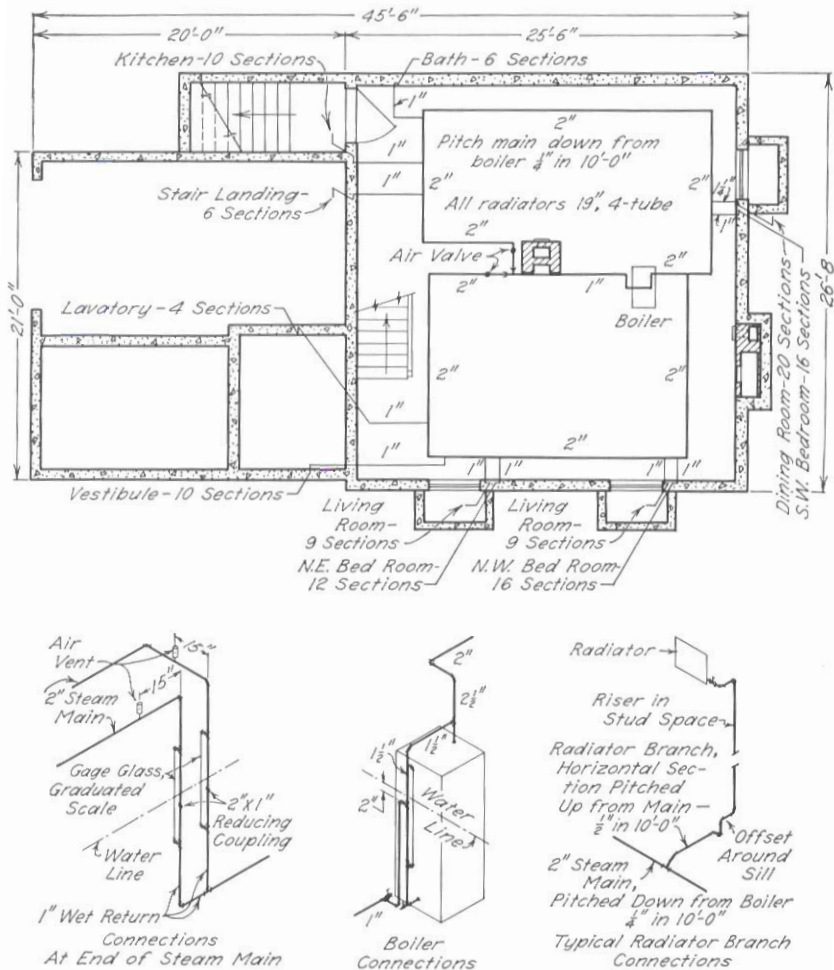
BASEMENT PLAN, SHOWING PIPING SYSTEM FOR ONE-PIPE STEAM SYSTEM
